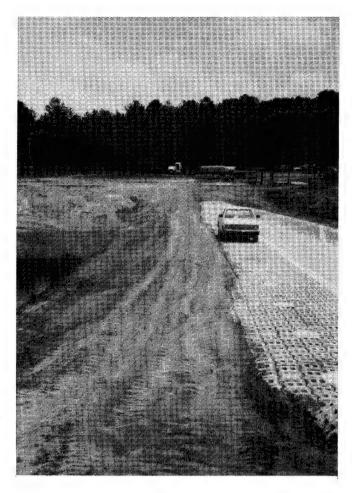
Completed CCM installation on crest of dam prior to placement of seeded topsoil, Wilkerson Lake Dam
